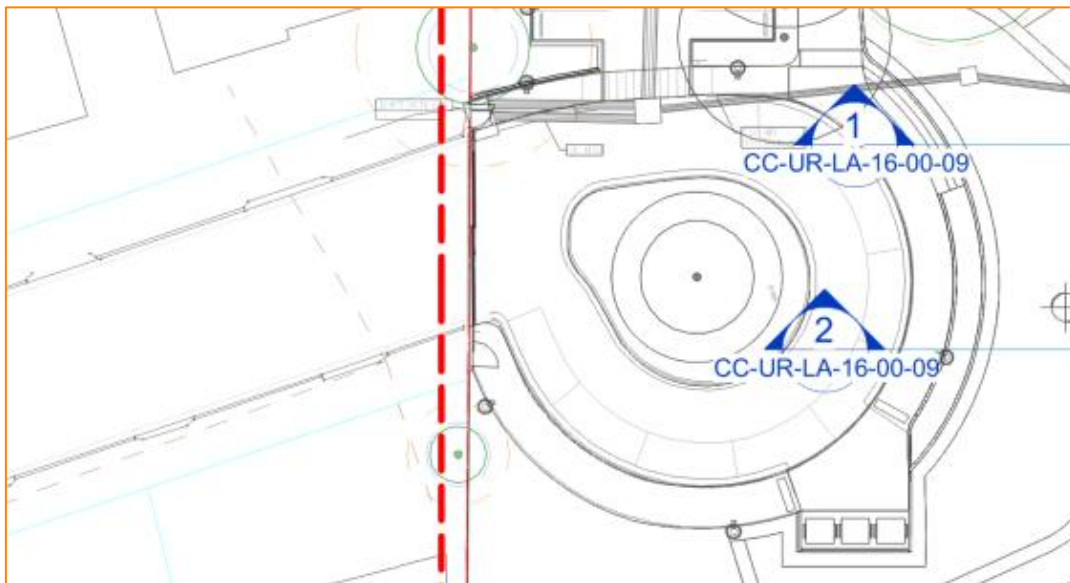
CWPS On-site Kiss & Ride Zone (Felton Road West)
